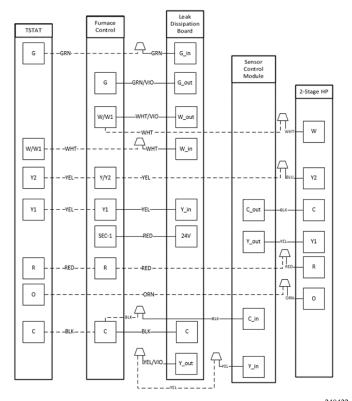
2-Stage Heat Pump Tstat Wiring with Furnace Coil Control, Sensor Control Module, and Leak Dissipation Board
